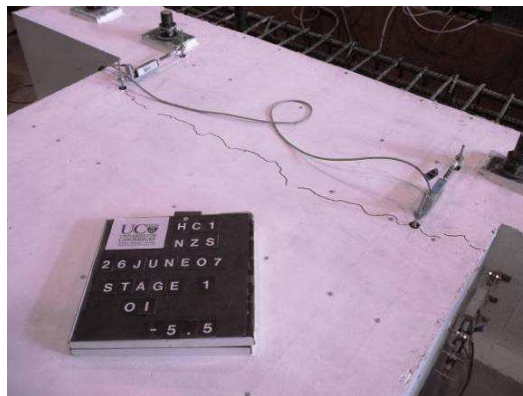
Increment 2 – First crack in topping concrete, 100 mm from interface
